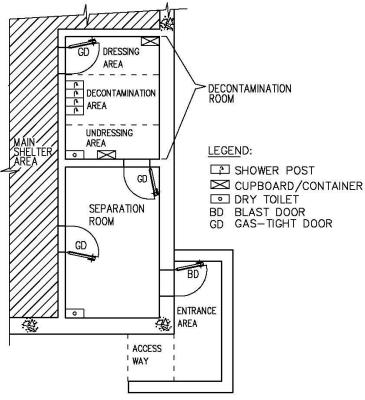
Plan - Typical Layout Of Separation Room And Decontamination Rom
